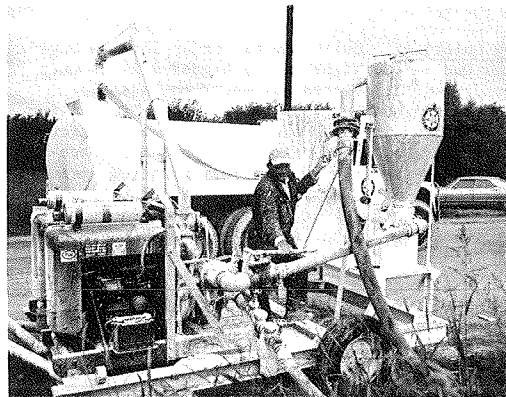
Jet slurry mixing plant-Dallas County, Texas (Ref 16).
